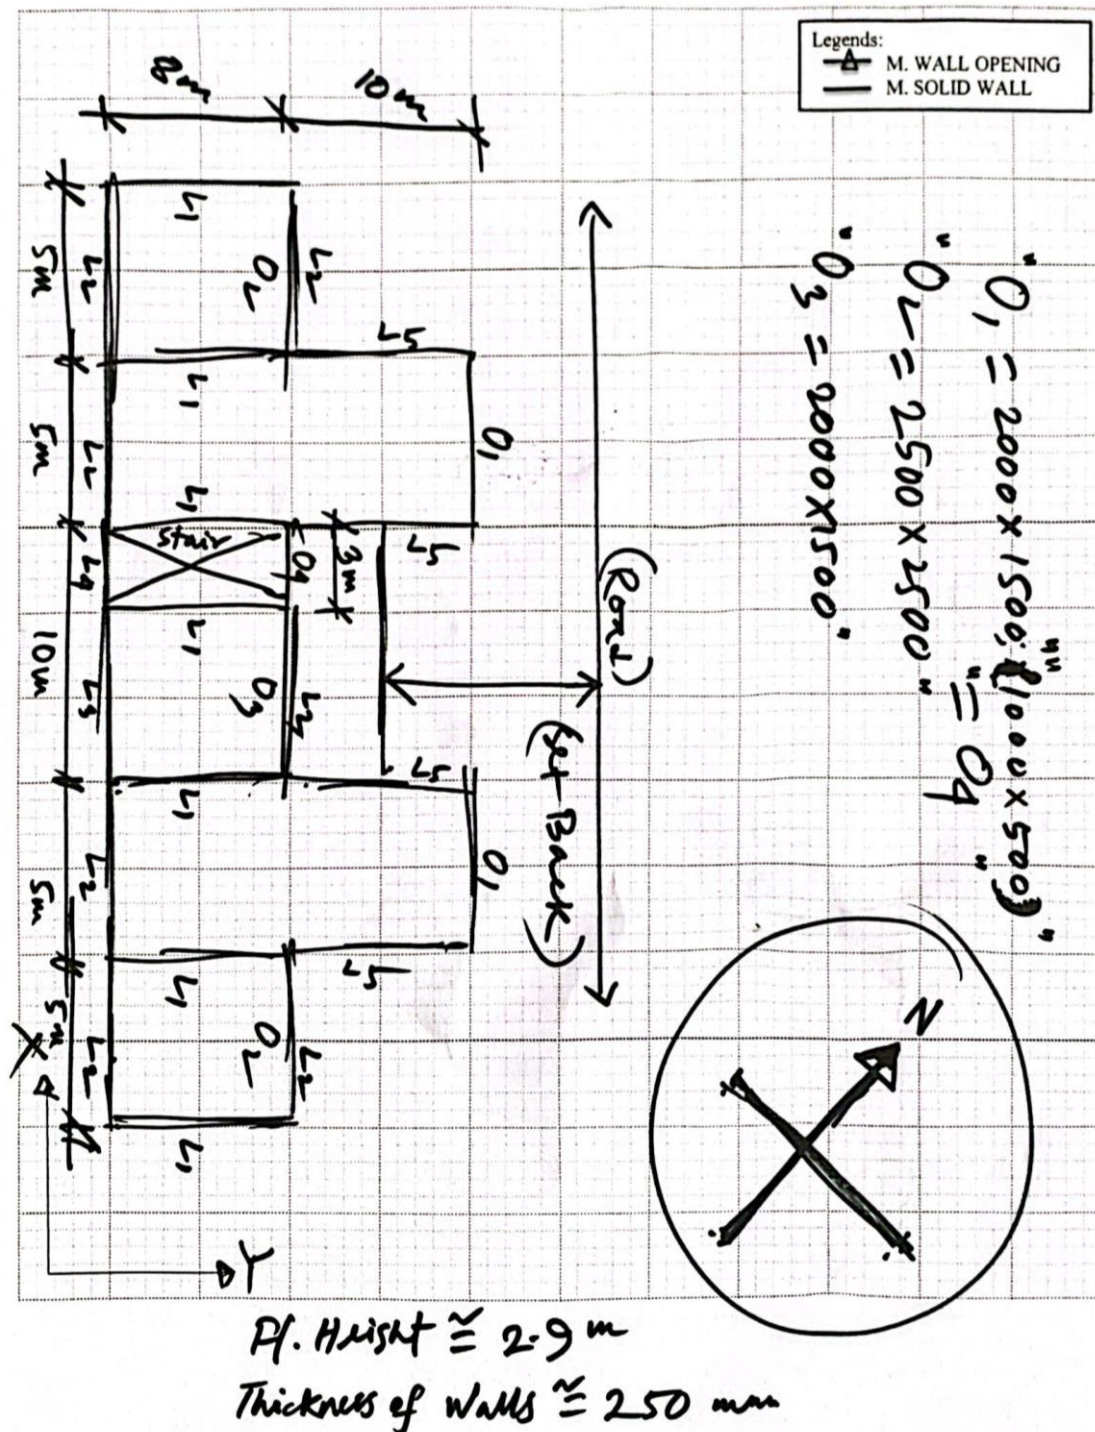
On-site rough sketch of the building segment showing masonry walls with and without an opening sample.
